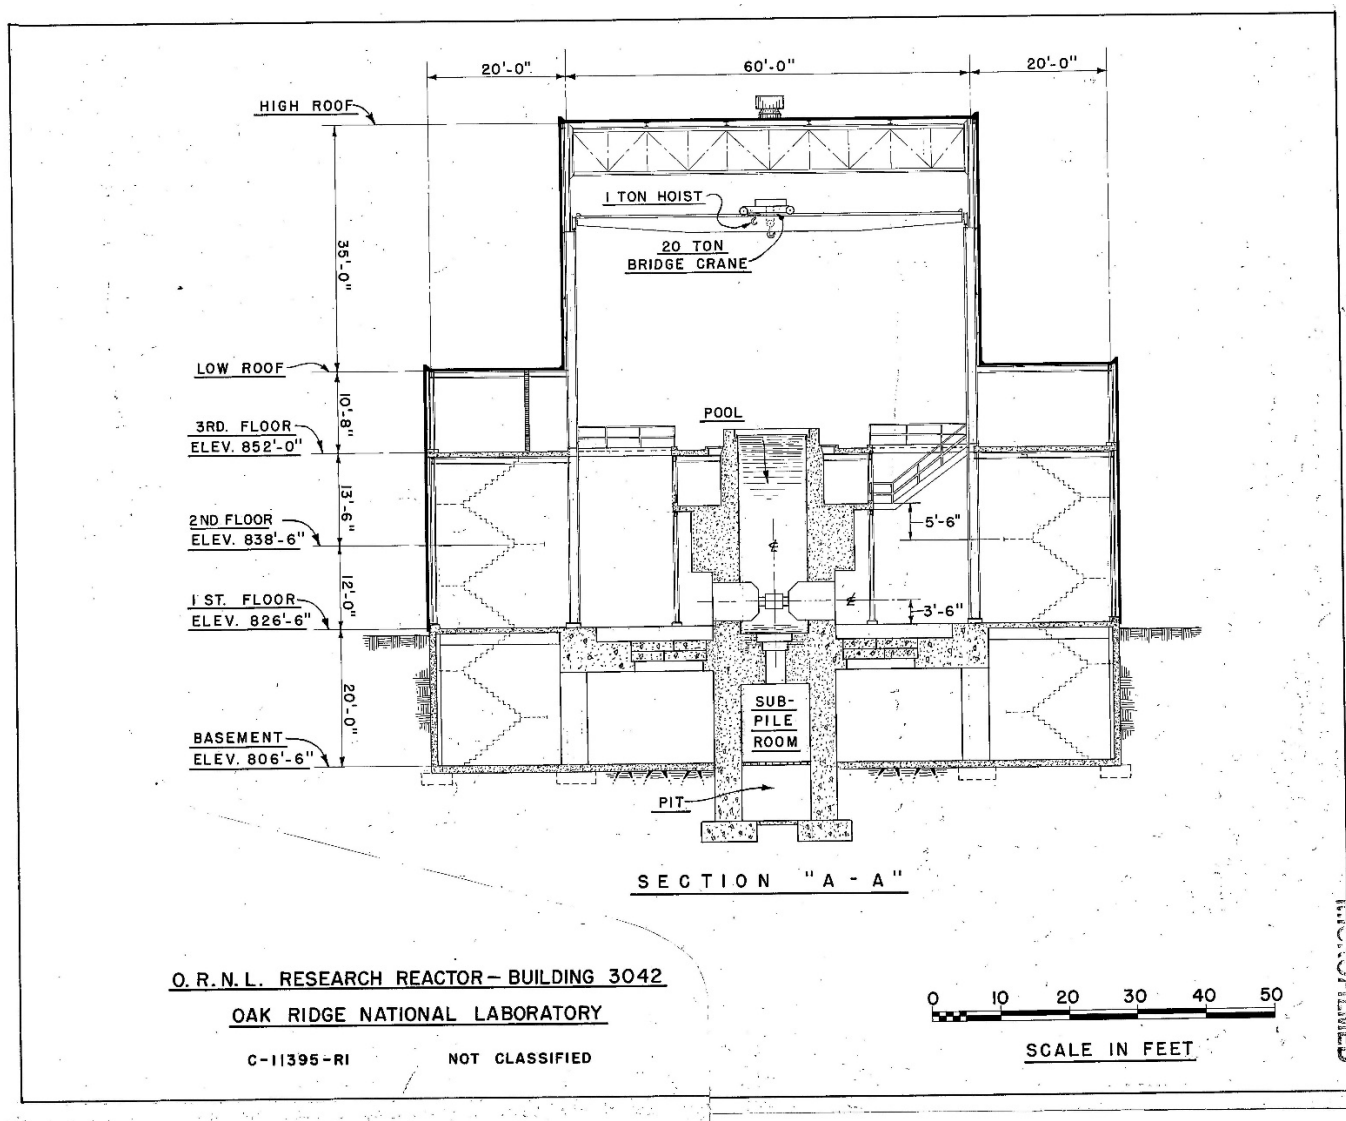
East to west vertical section of Building 3042 including the Oak Ridge Research Reactor structure (Oak Ridge National Laboratory, n.d.).
